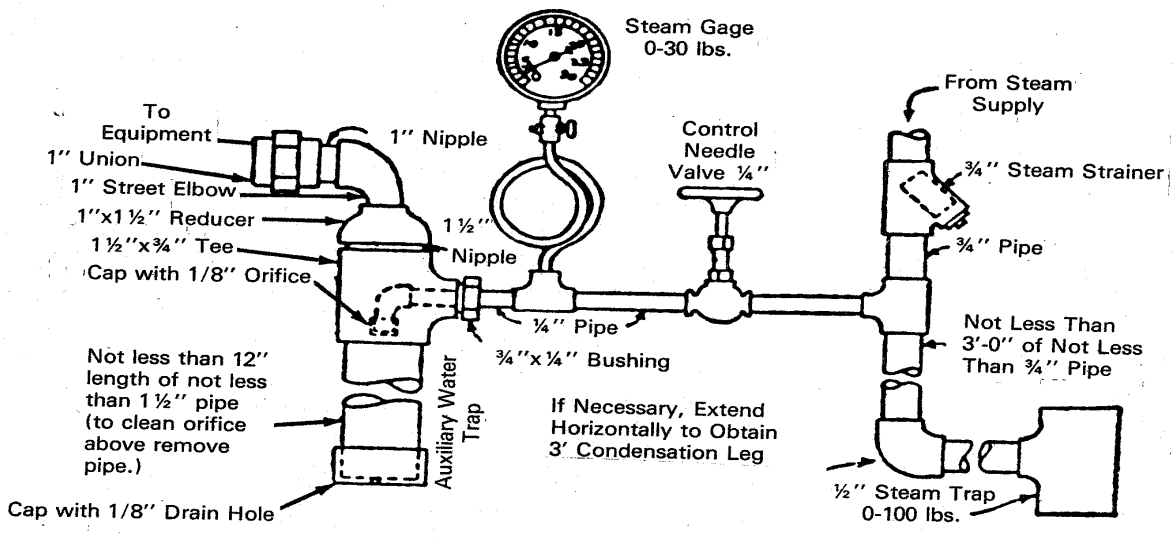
Culinary Steam Piping Assembly for Airspace Heating or Defoaming
